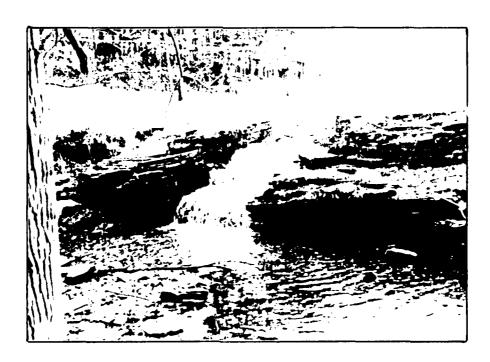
View of Downstream Side of Dam from Left Abutment
